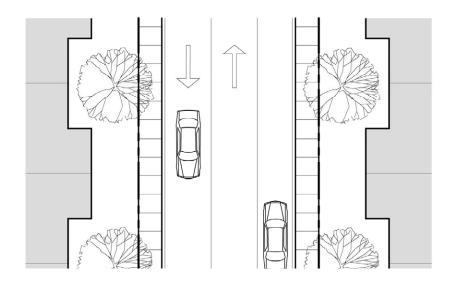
Conceptual cross-section of the 11.6m right-of-way in Condo Block 'A'.
